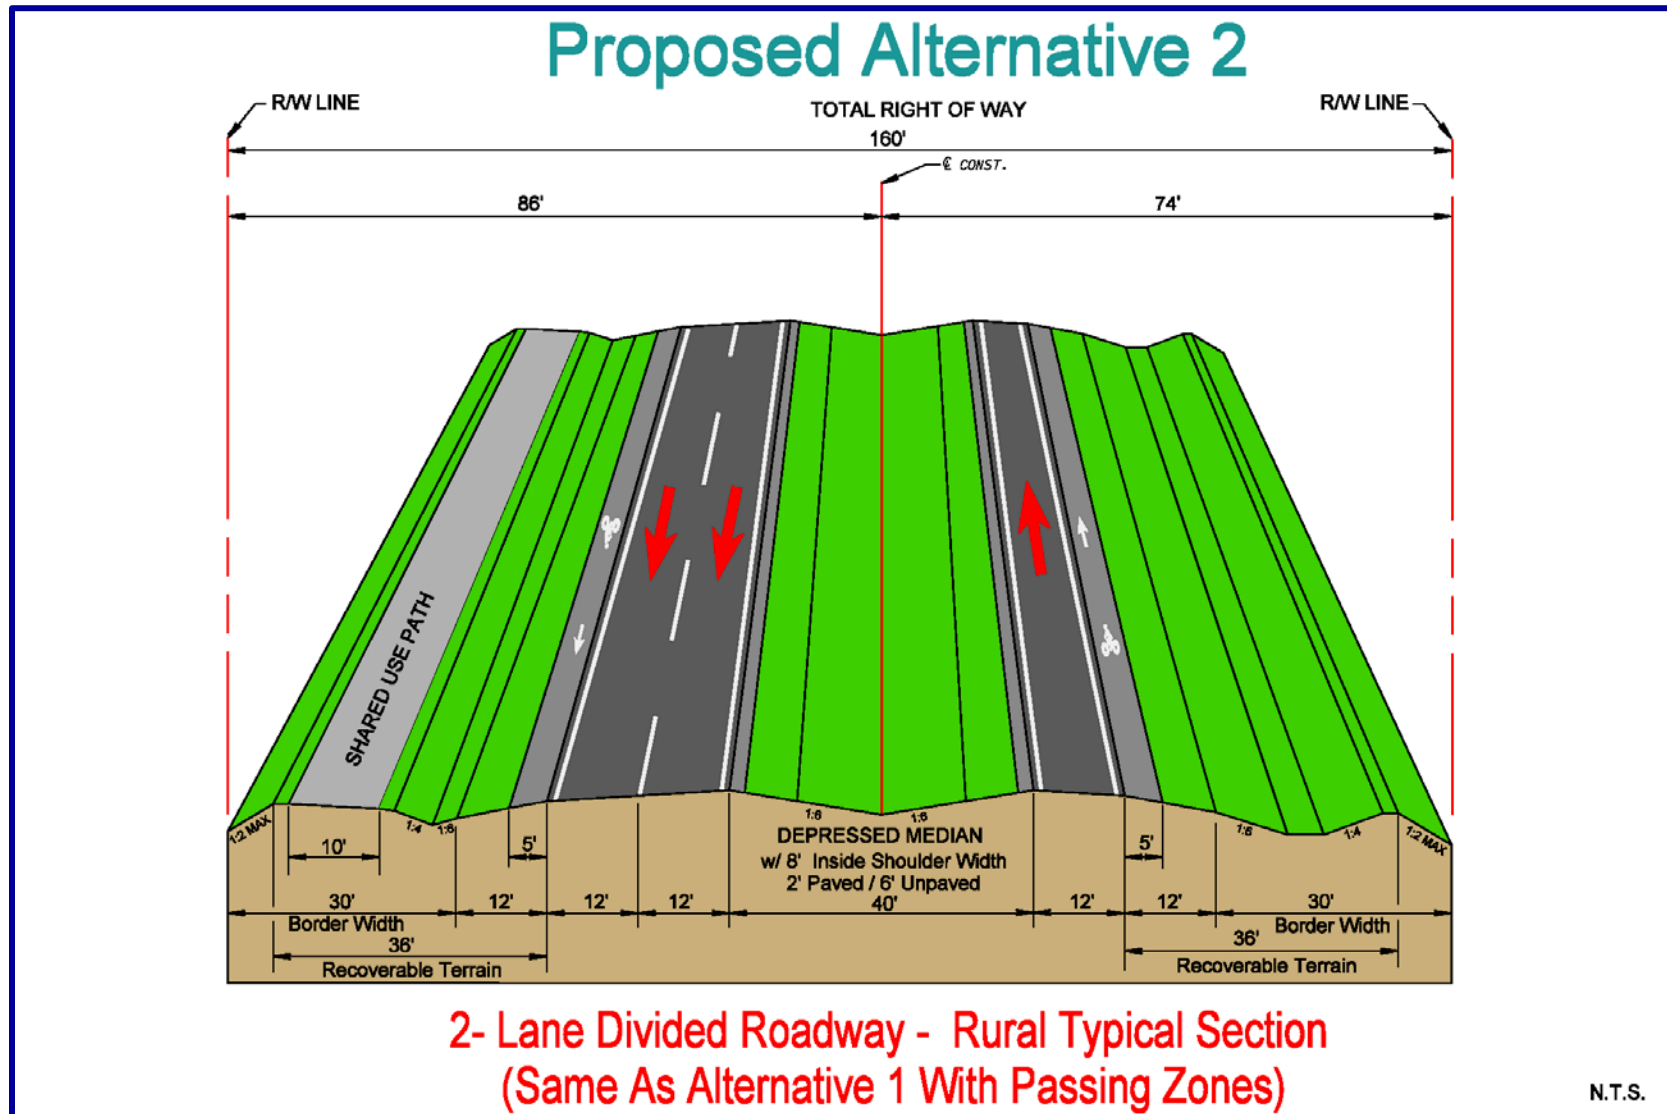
Alternative 2 Proposed Typical Roadway Section (Rural)
